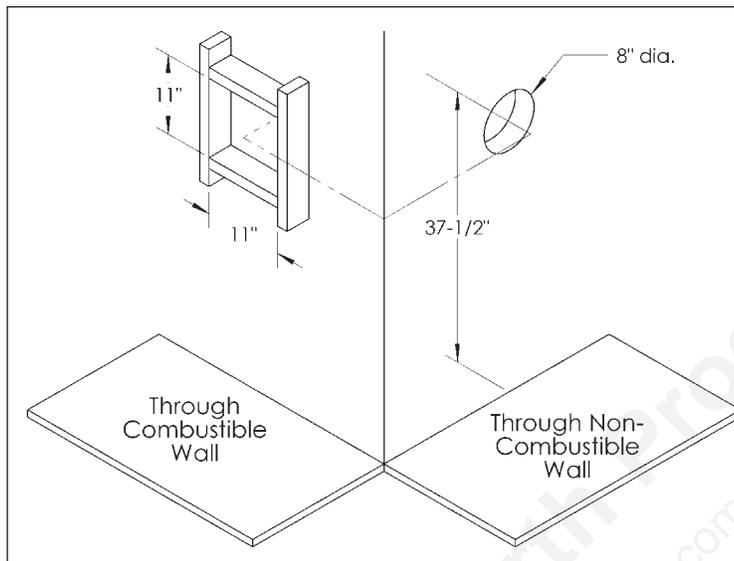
Side wall hole dimensions for flush wall installations. For other installations where the unit is far away from the wall, ensure that the vertical rise is 1/4" for every 12" of horizontal run.
